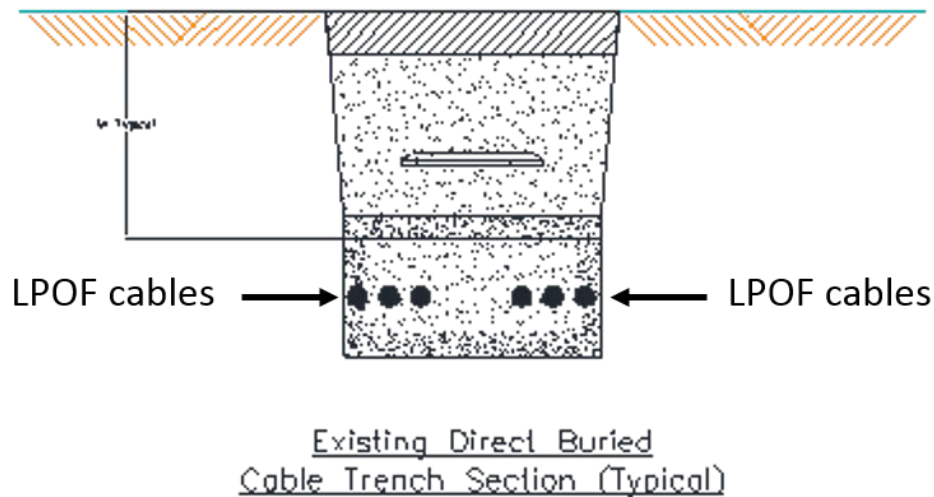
Schematic Layout of the Existing Cable Configuration
